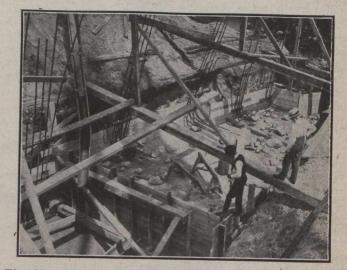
Footing of West Wing of North Abutment; Reinforcement Rods for Counterforts
